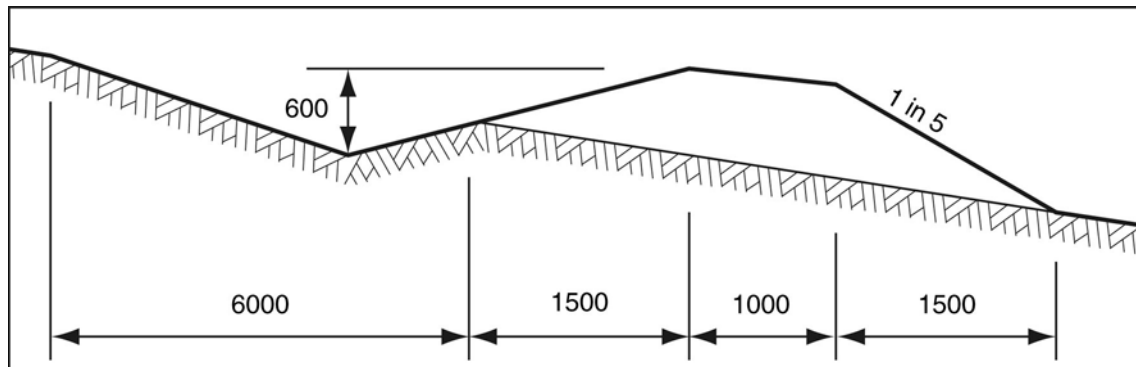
Trafficable cross bank (berm) construction (10 width)
